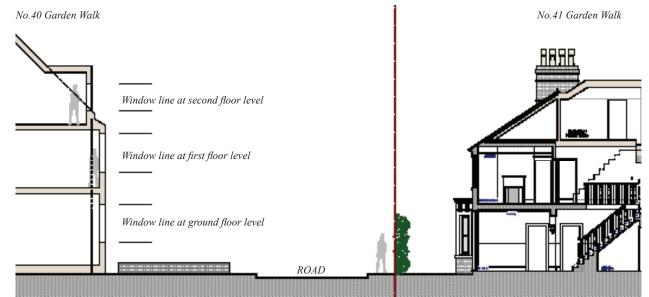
Section showing height of dormer apex set back from and beyond the existing roof ridge line and no visibility from road or main living rooms of three storey houses opposite, top floor of no.40 believed to be a bathroom. No.40 not surveyed; levels taken from external bricks
